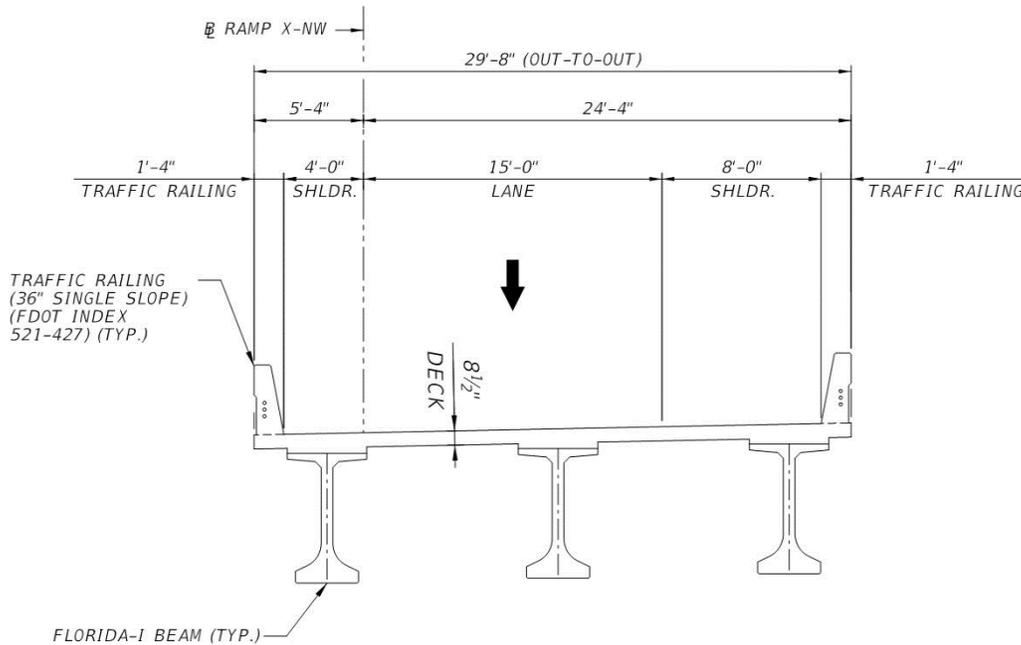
Bridge Typical Section (Bridge No. 5)
